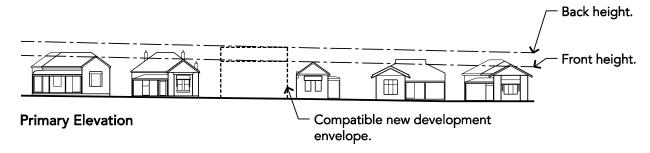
Street elevation illustration compatible roof envelopes - Griffiths Architects 2012.
